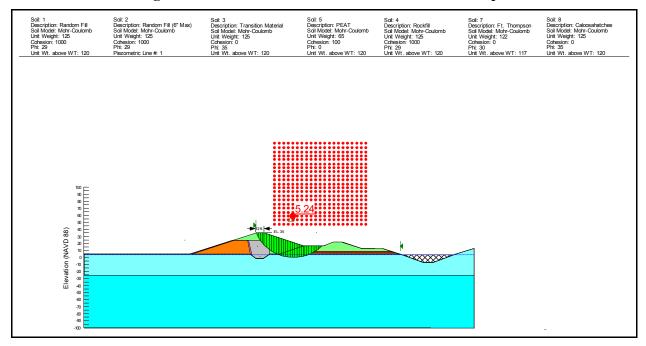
Steady Seepage with Normal Pool Downstream Slope
